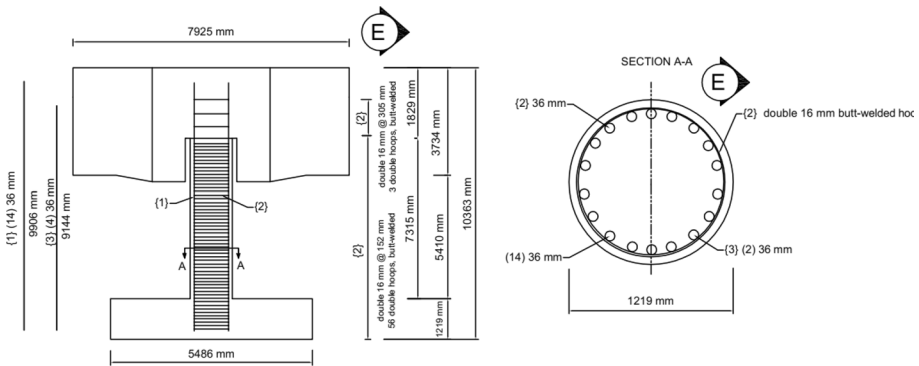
Full-scale RC bridge pier specimen and cross-section (Schoettler et al. 2015)
